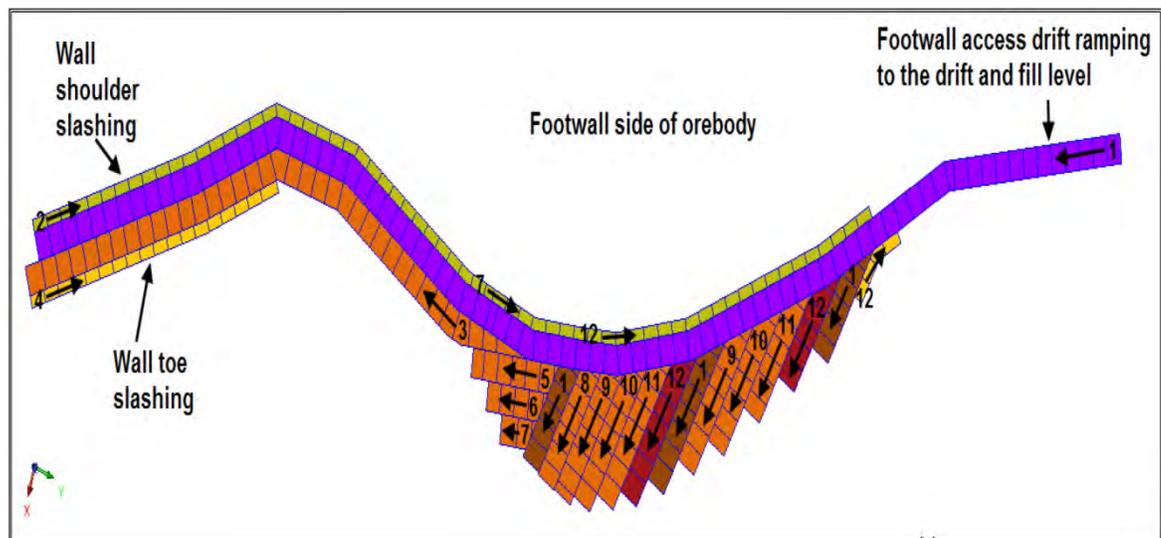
Drift and Fill Horizon Mining Sequence – Plan View
